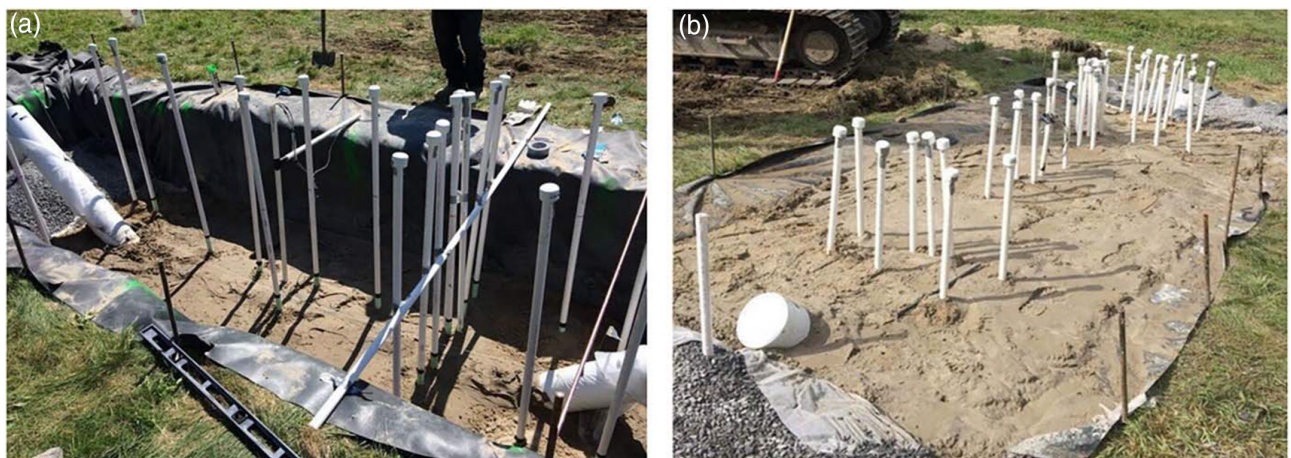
Photographs of piezometer placement during (a) and following (b) test pit construction.
